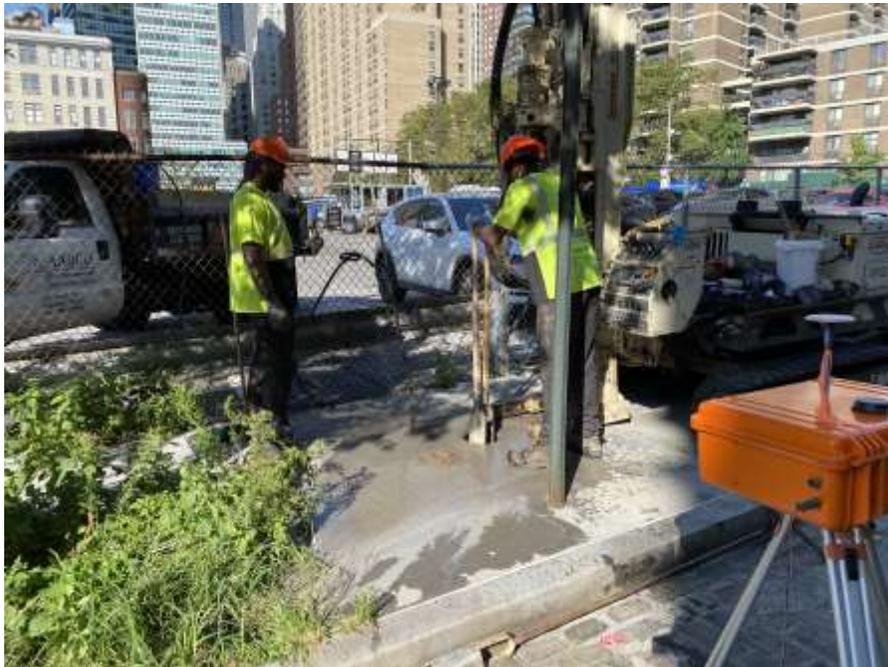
AARCO attempting to hand clear boring SB34 (facing west)
